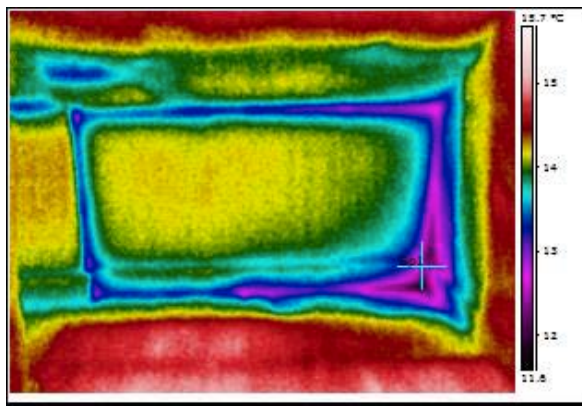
Room S18, attic space. The image shows thermal bridges at the junctions between external wall and roof in the second floor.
